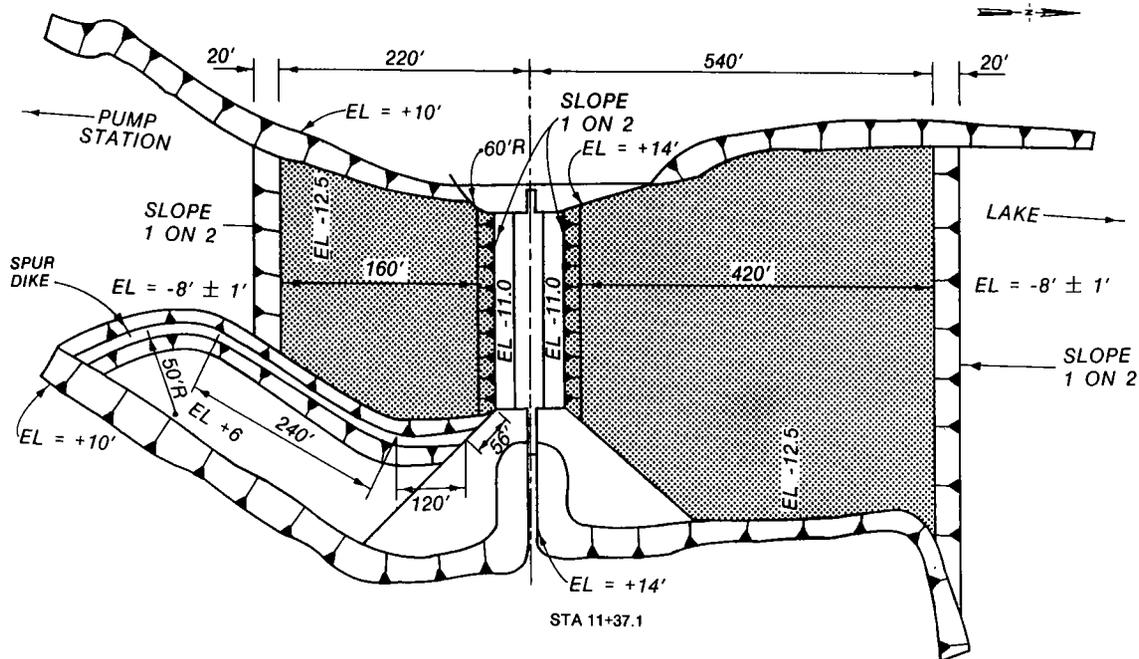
Recommended canal alignment and excavation upstream and downstream of the structure
